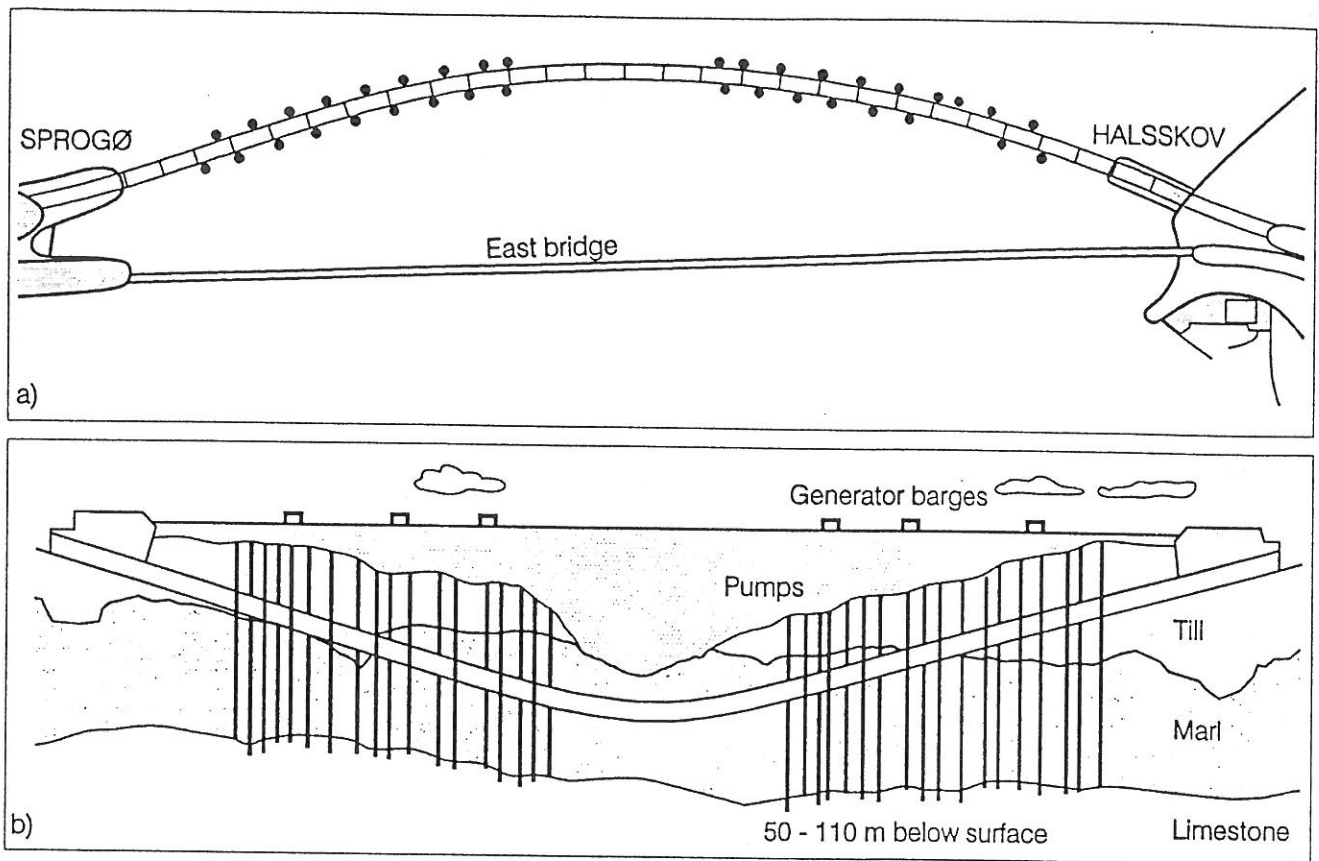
Schematic layout of MOSES project. (a) plan of well positions; (b) alignment cross section
